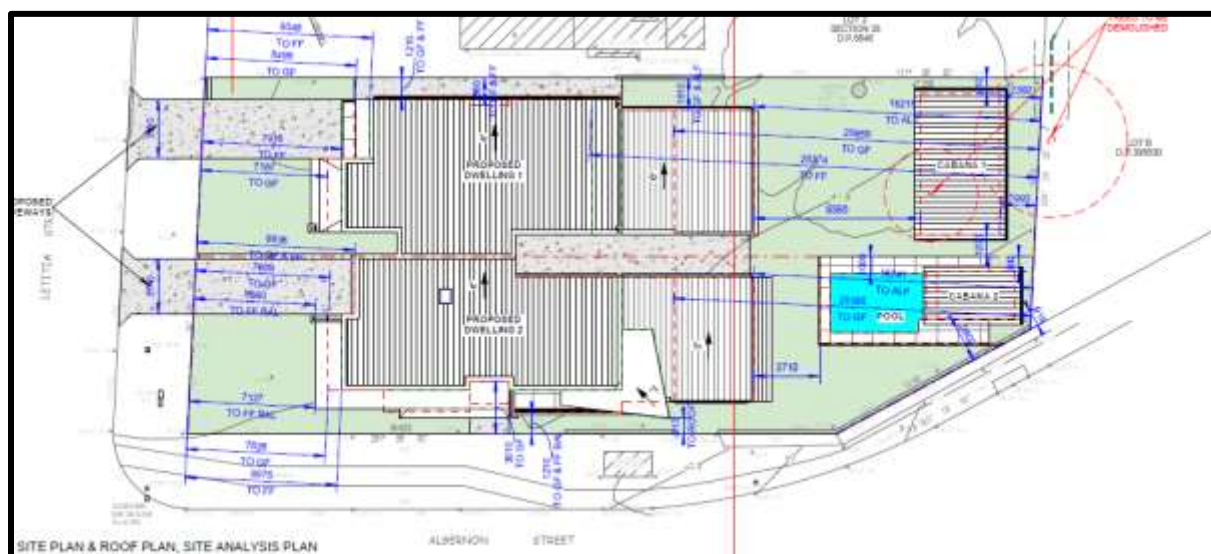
Proposed site plan (Source: Nemco Design 2021).
